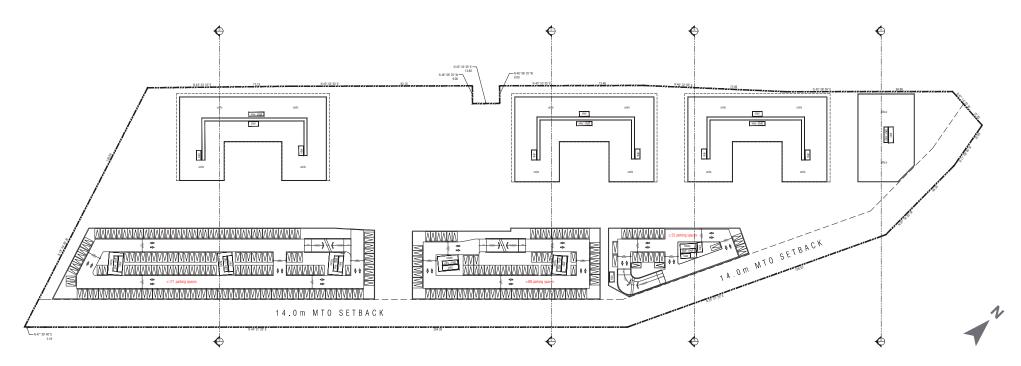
P1 Underground Parking Plan (Top) and 2nd Floor Plan (Bottom) Prepared by Graziani + Corazza Architects [Date Prepared: Oct 25, 2023]
